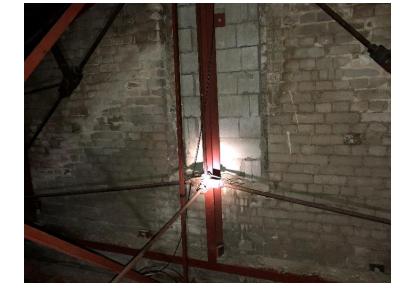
East Gable front element strengthening girt has no effect on outwards movement as no fixing to wall and only at one location.
